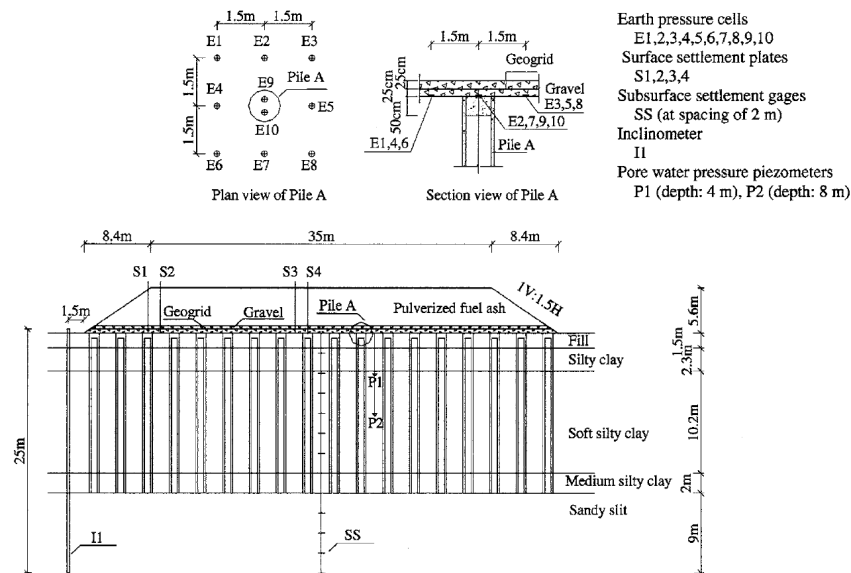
Instrumentation plan showing the embankment geometry, piles configuration, subsoil profile, and key instrumentation points (Liu et al., 2007).
